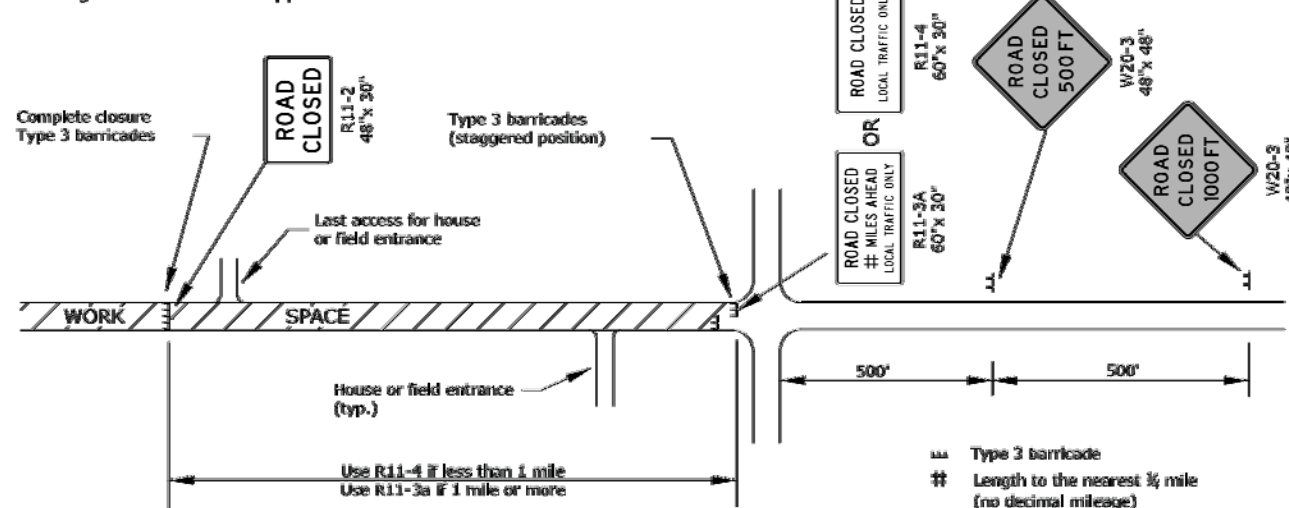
TYPICAL SIGNING FOR ROAD CLOSURE - LOCAL TRAFFIC ACCESS
